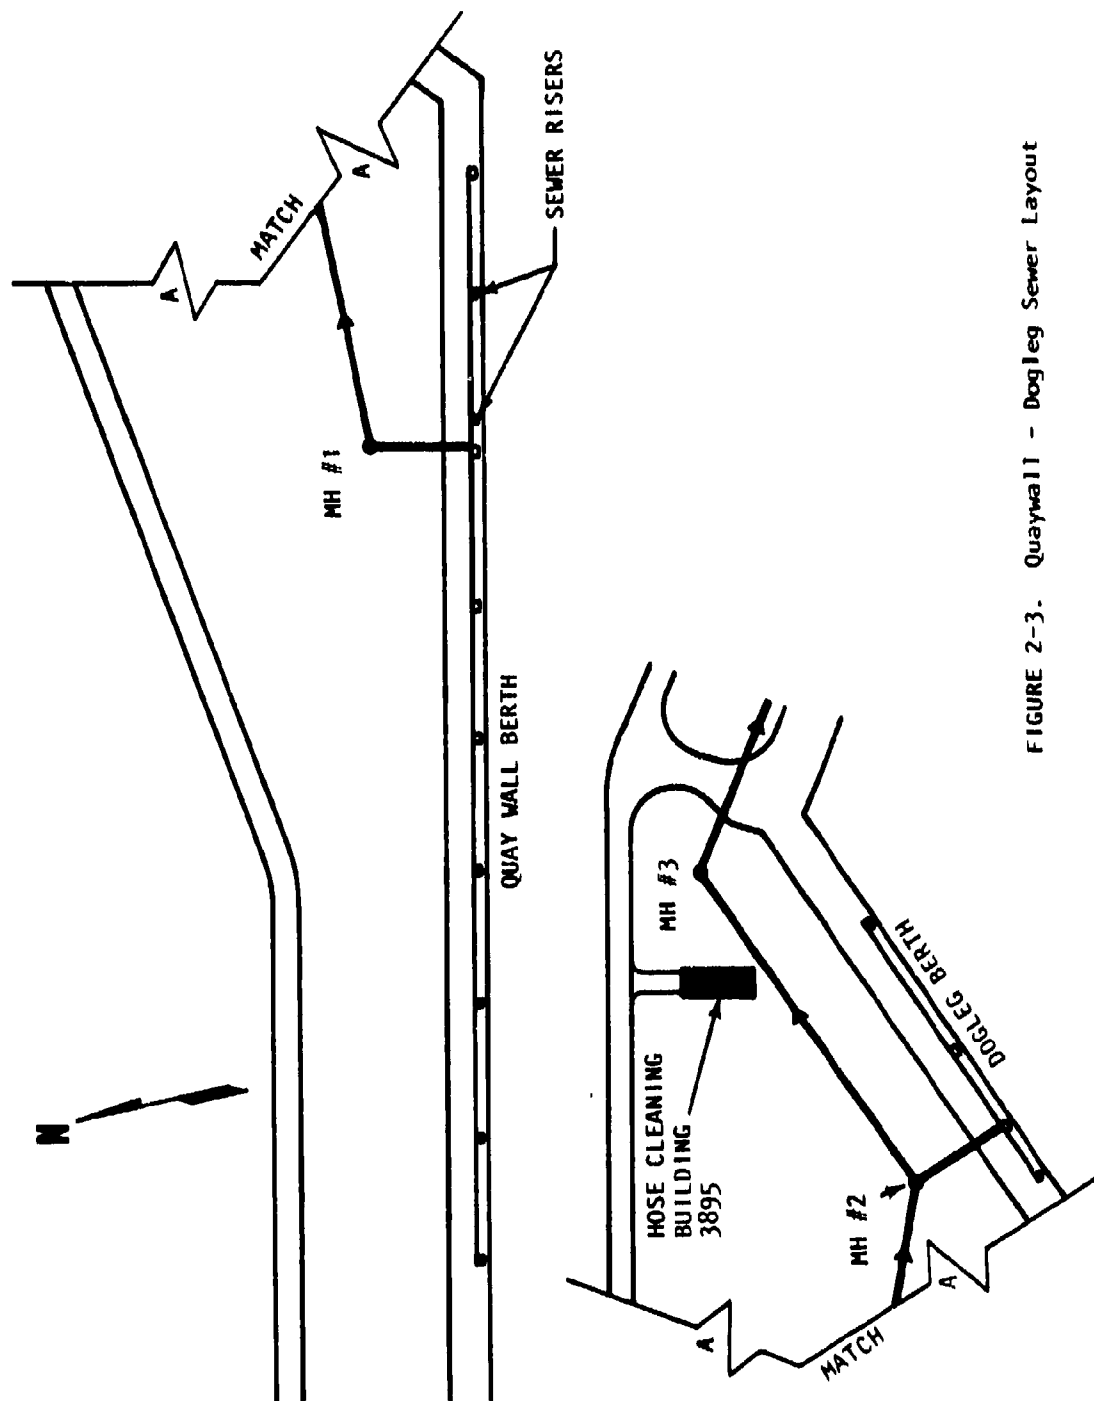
Quaywall - Dogleg Sewer Layout
